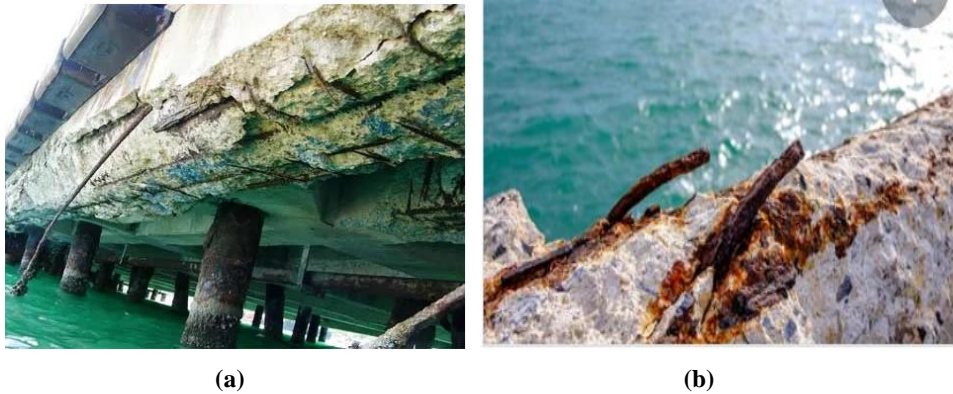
Degradation of rebar in reinforced concrete structure at sea area
